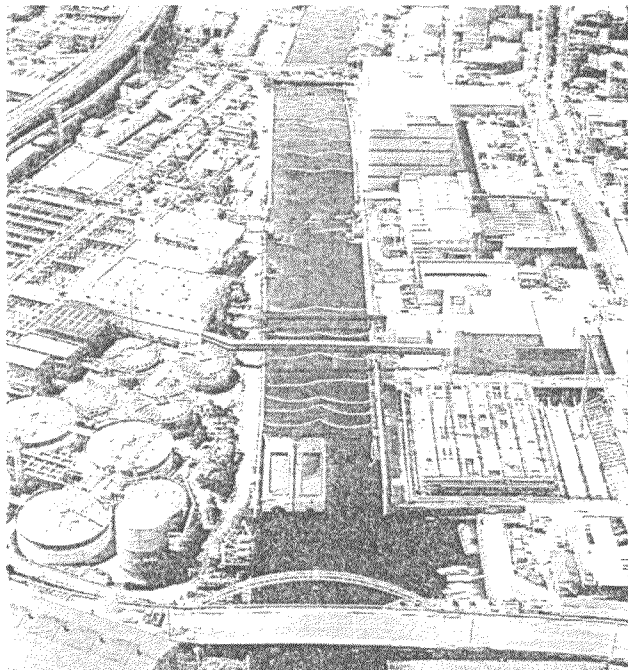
Higashinada Wastewater Treatment Plant and Adjacent Canal Which Is Partitioned to Serve as a Temporary Sedimentation Tank
